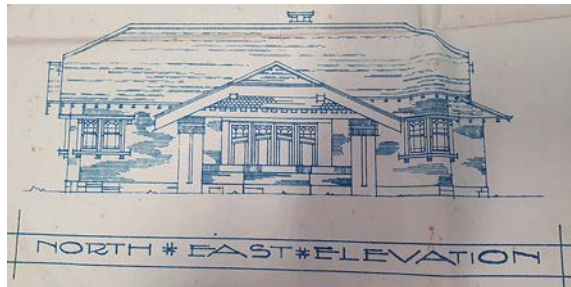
5A Vivian Street, Bellevue Hill North-East Elevation
